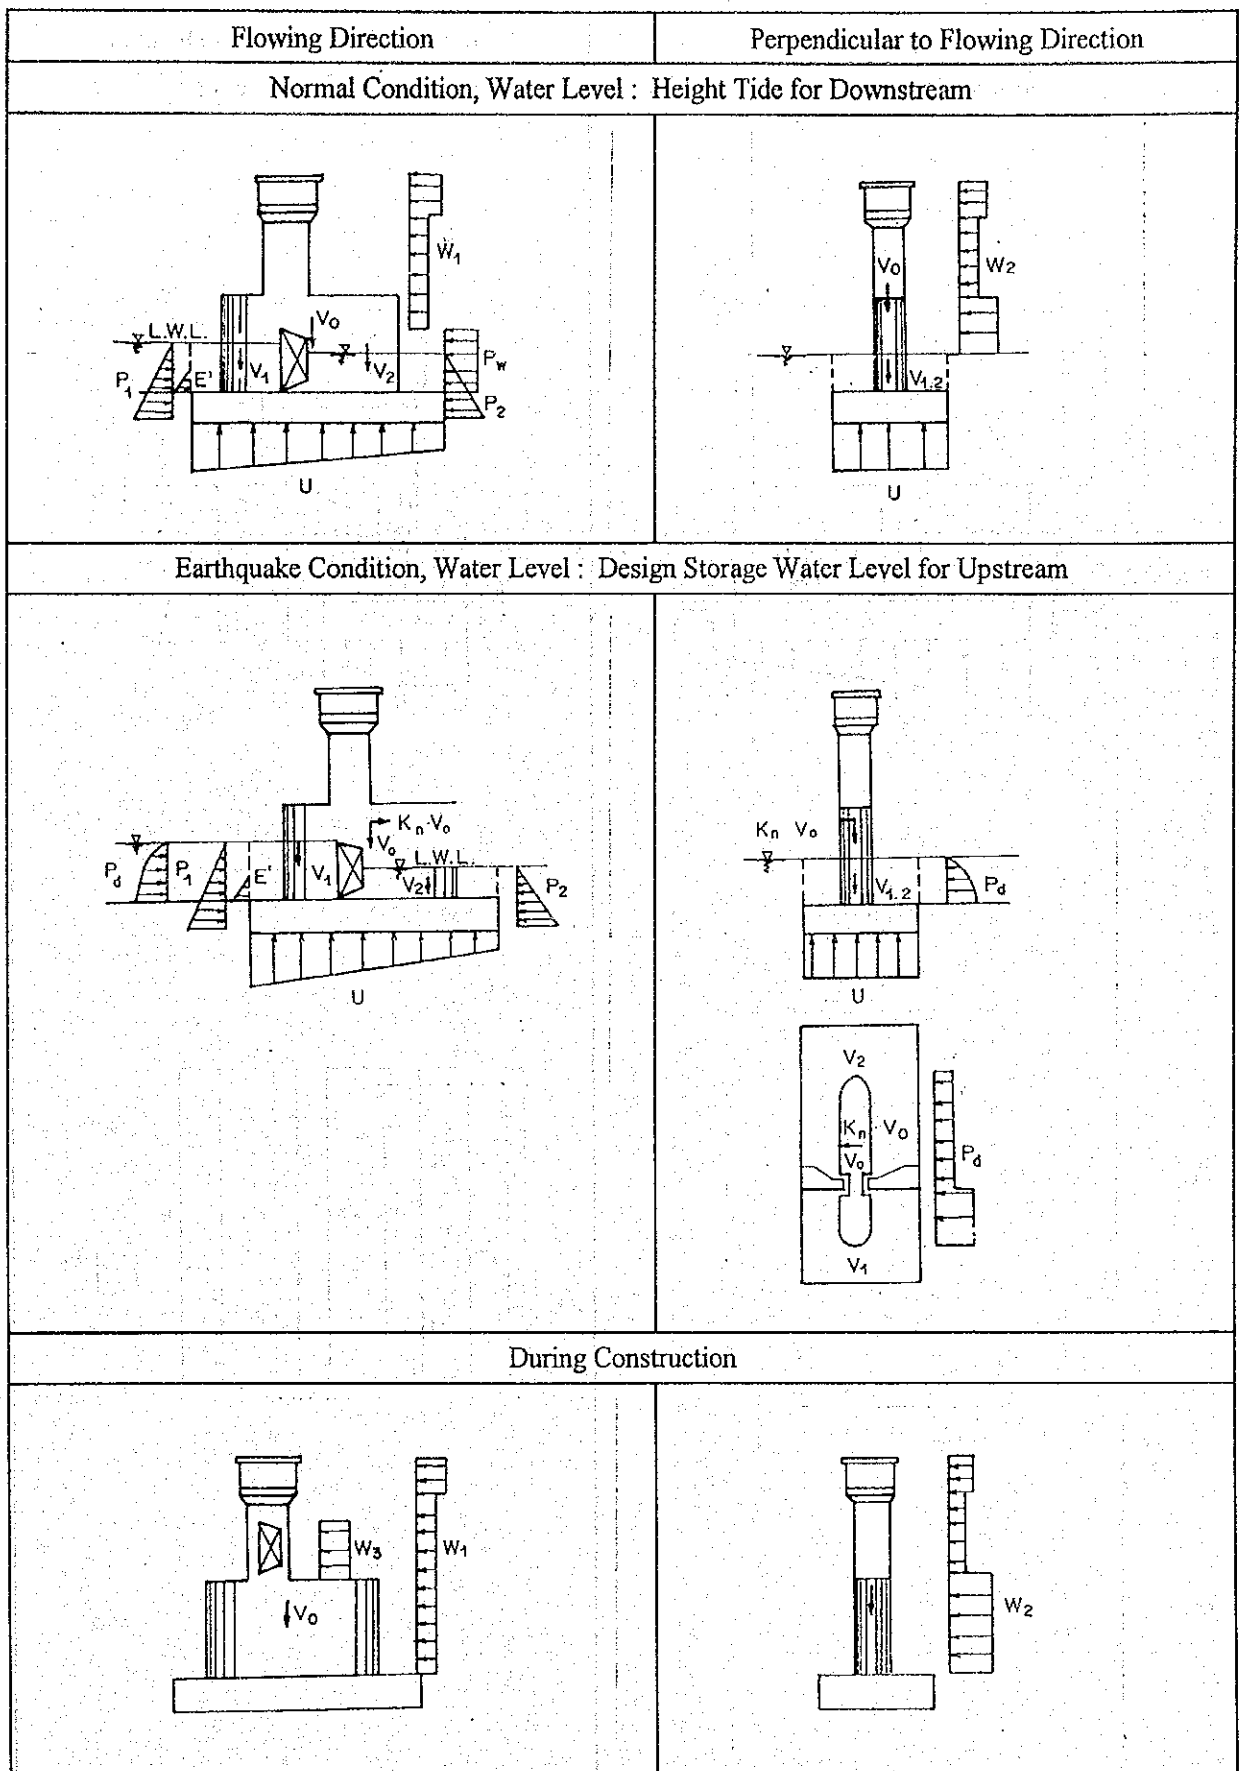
(2/2) Loading Conditions for Center Piers of Weir
